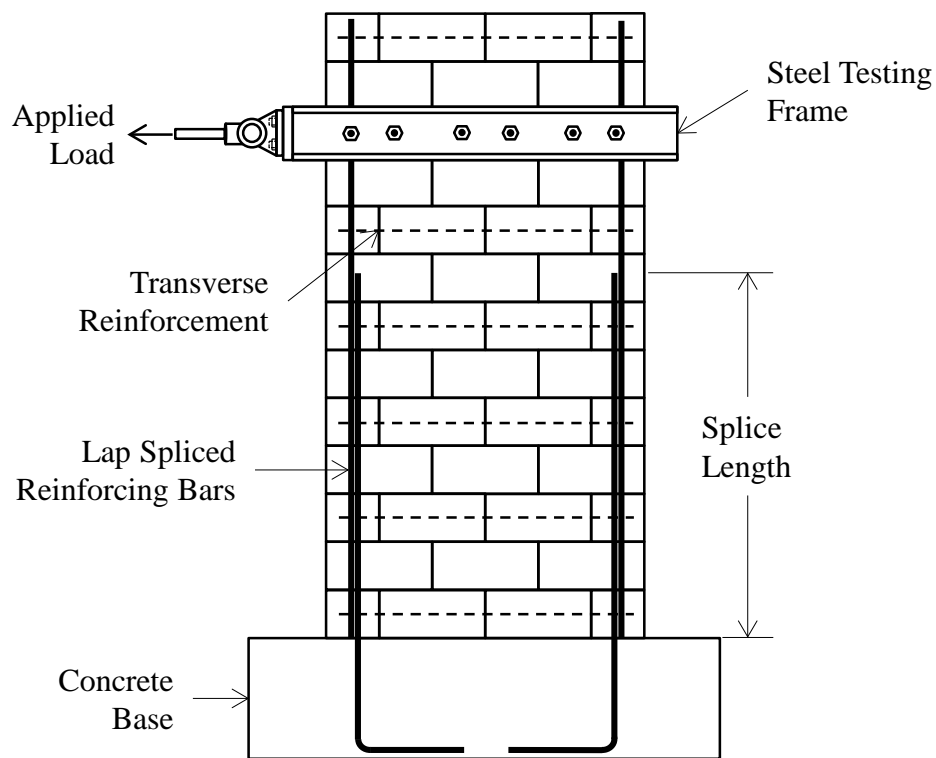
Testing setup and reinforcement arrangement of the wall splice specimens tested by Mjelde – Modified from Mjelde (2008).
